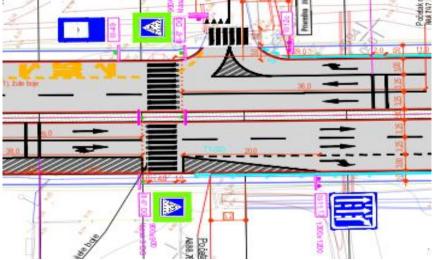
Proposed uncontrolled pedestrian crossing over multiple traffic lanes at Site 3.
